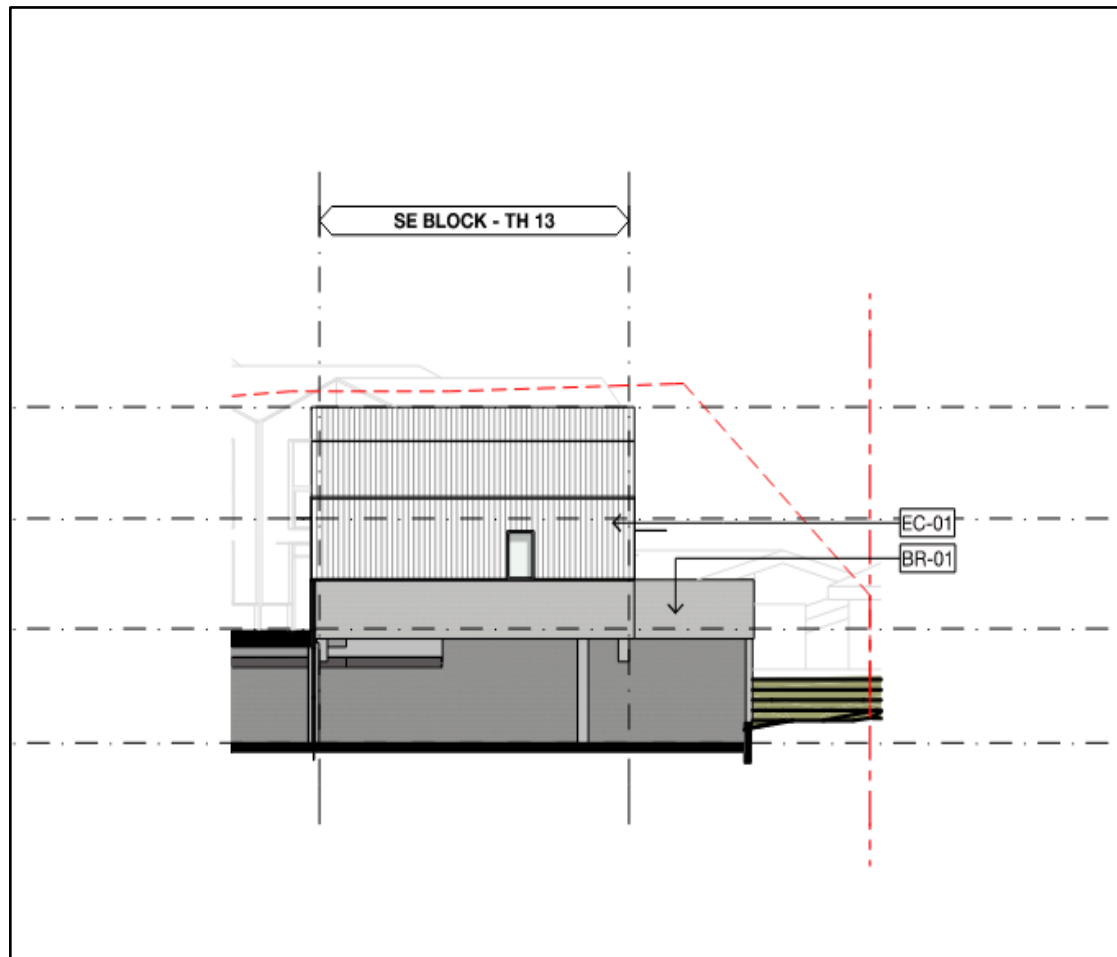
South East Block as compliant with the building envelope determined in accordance with the Acceptable Solution of clause 8.4.2 Setbacks and building envelope for all dwellings.
